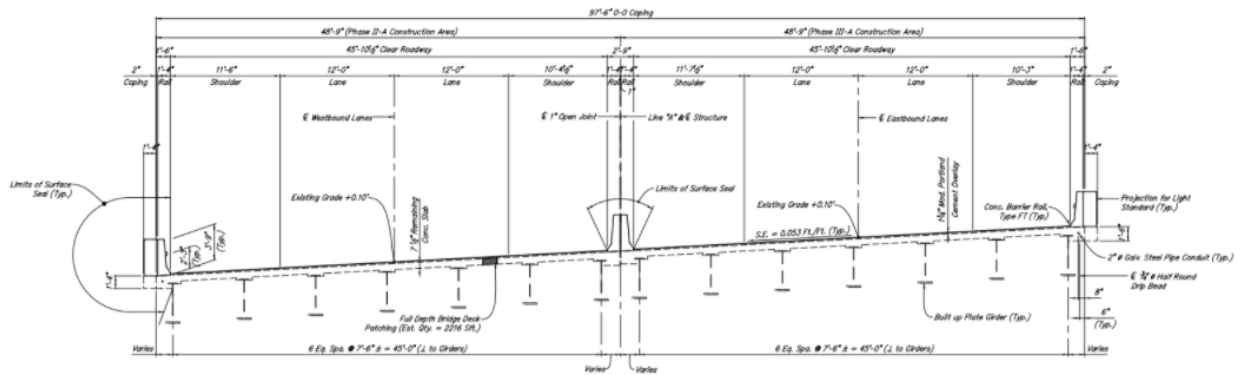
Typical Section of the Bridge (NBI 32841) (2014)
